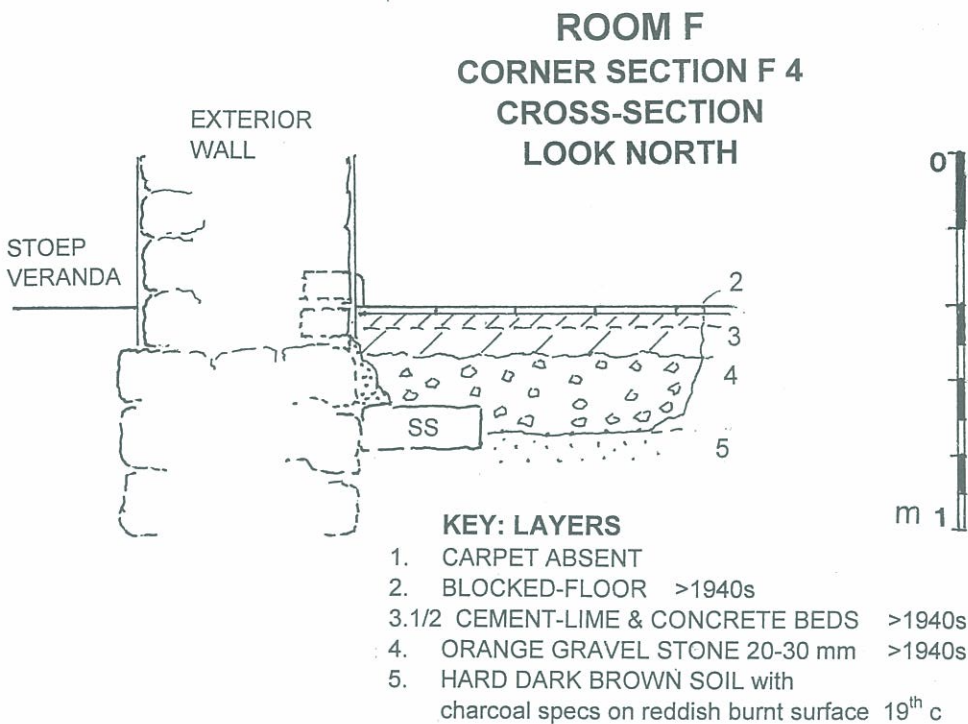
Elevation of the excavation F4, filled with gravel (>1940s) till 30cm below floor level.
